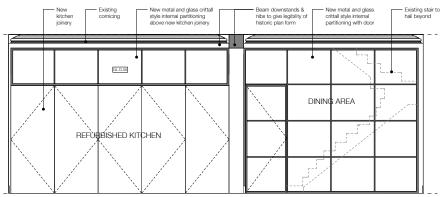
Proposed critall style glazed screen to ground floor spine wall
